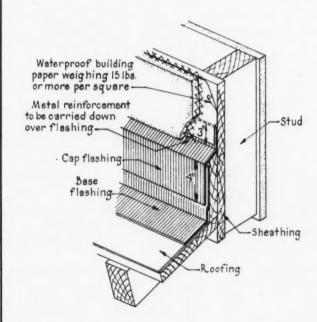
DETAILS OF FLASHING ON STUCCO COVERED PARAPET WALLS
